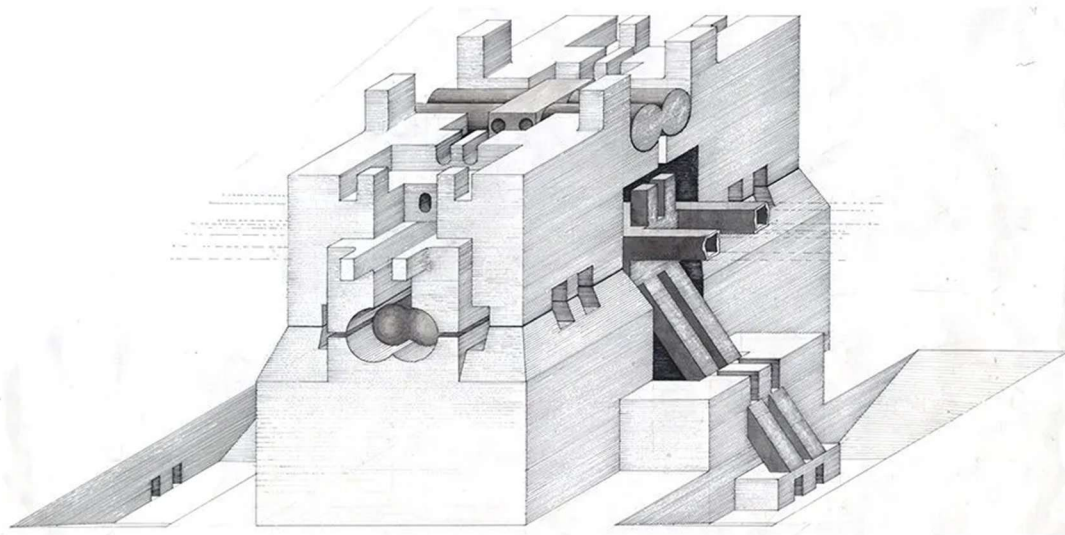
Underground Building, Isometric (Walter Pichler, 1963)
